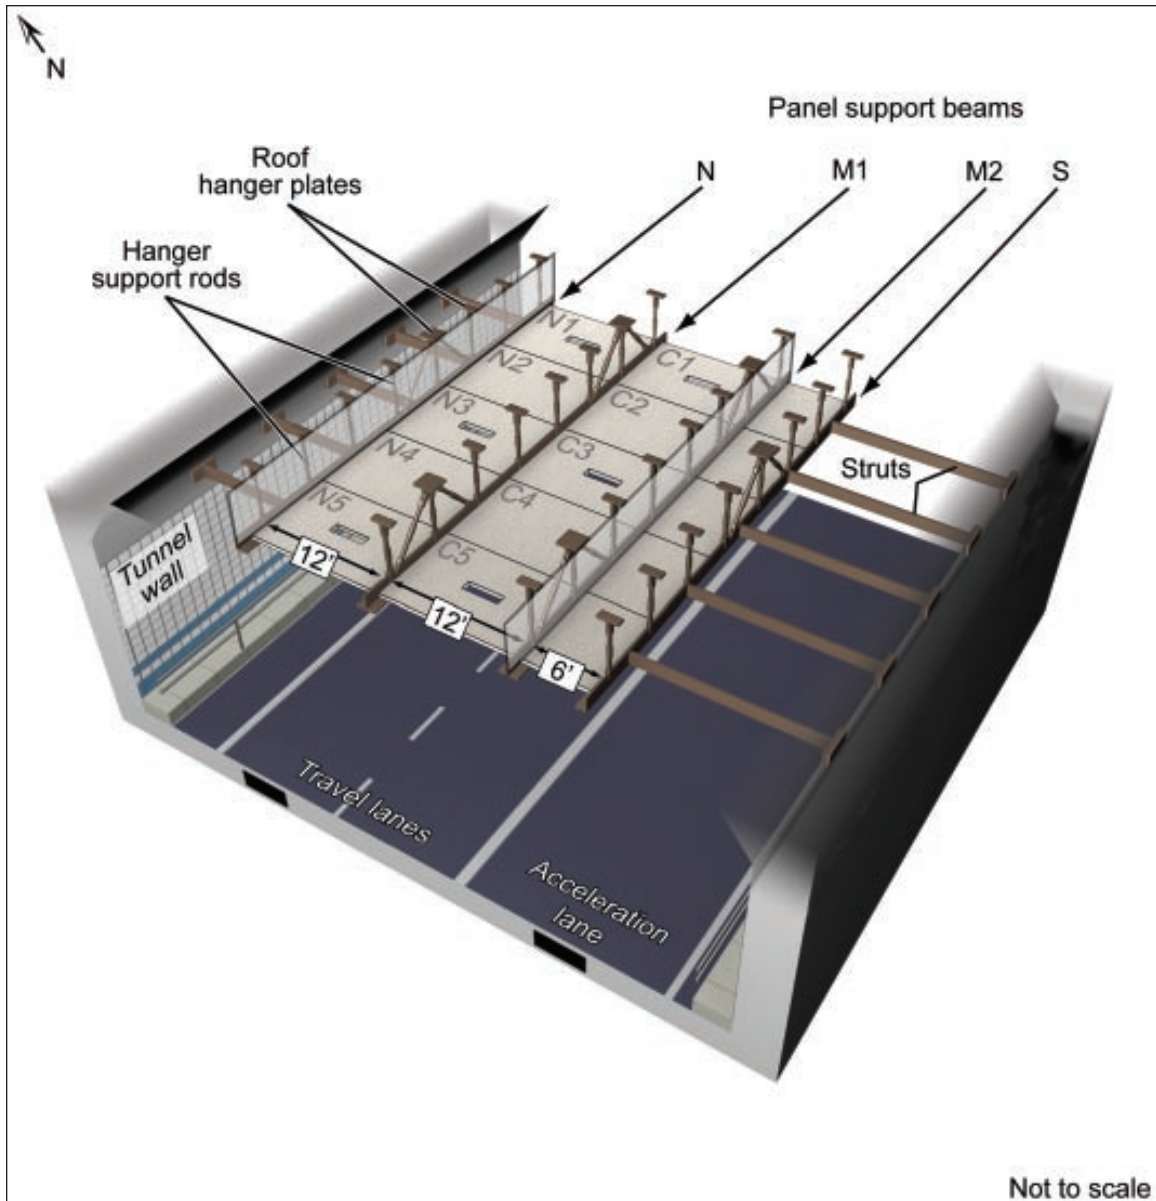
Overview of the support structure for the accident ceiling module. Panels and support beams show alphanumeric designations that were assigned during postaccident reconstruction.
